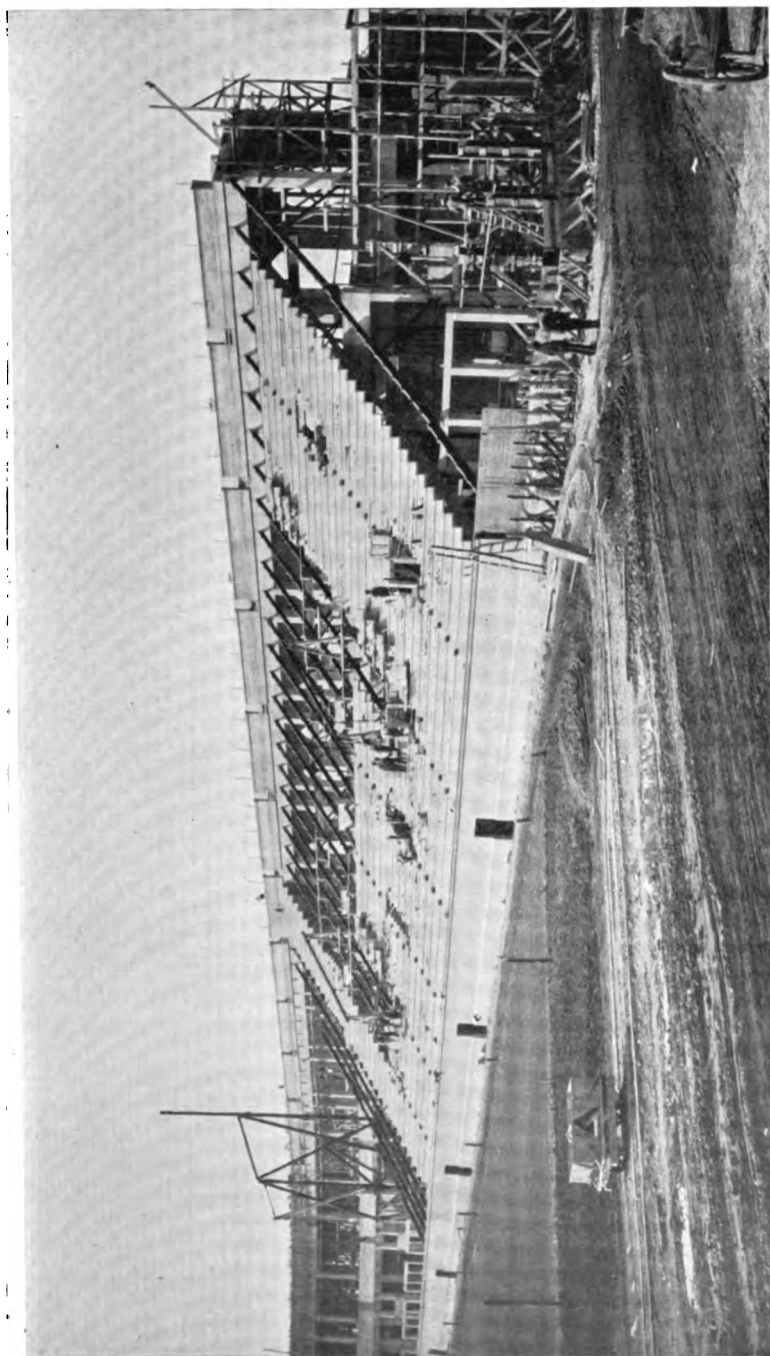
WEST WING UNDER CONSTRUCTION.
